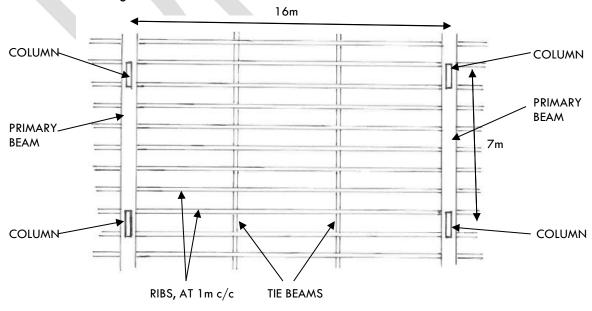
Typical 16m x 7m bay: Floor Structure
